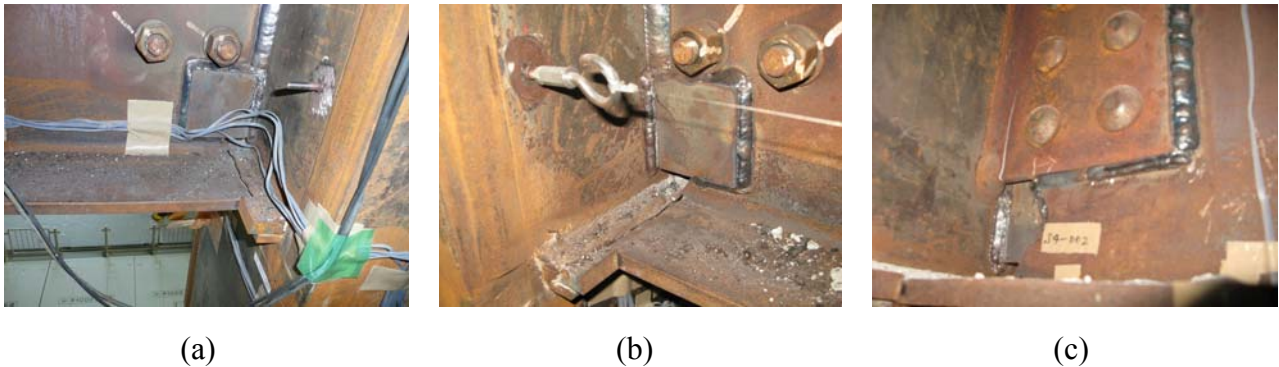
Fractures of the connection with modified supplemental welds: (a) Connection in EL; (b) Connection in ER ; (c) Cracking at the shear tab
